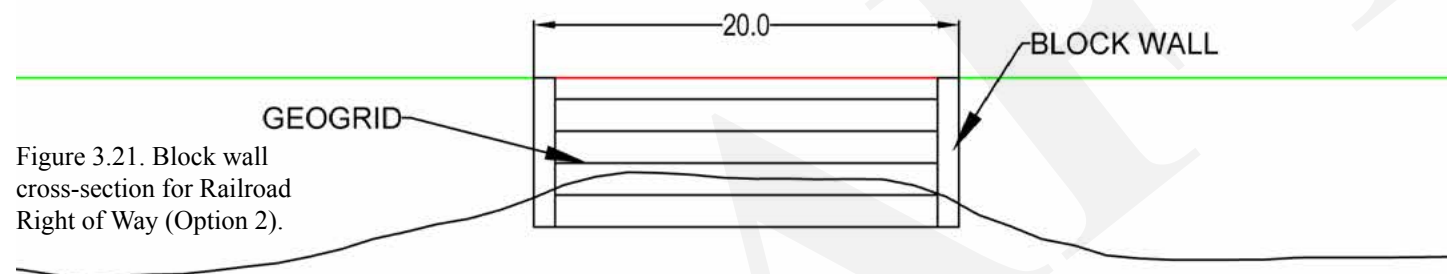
Block wall cross-section for Railroad Right of Way (Option 2).
